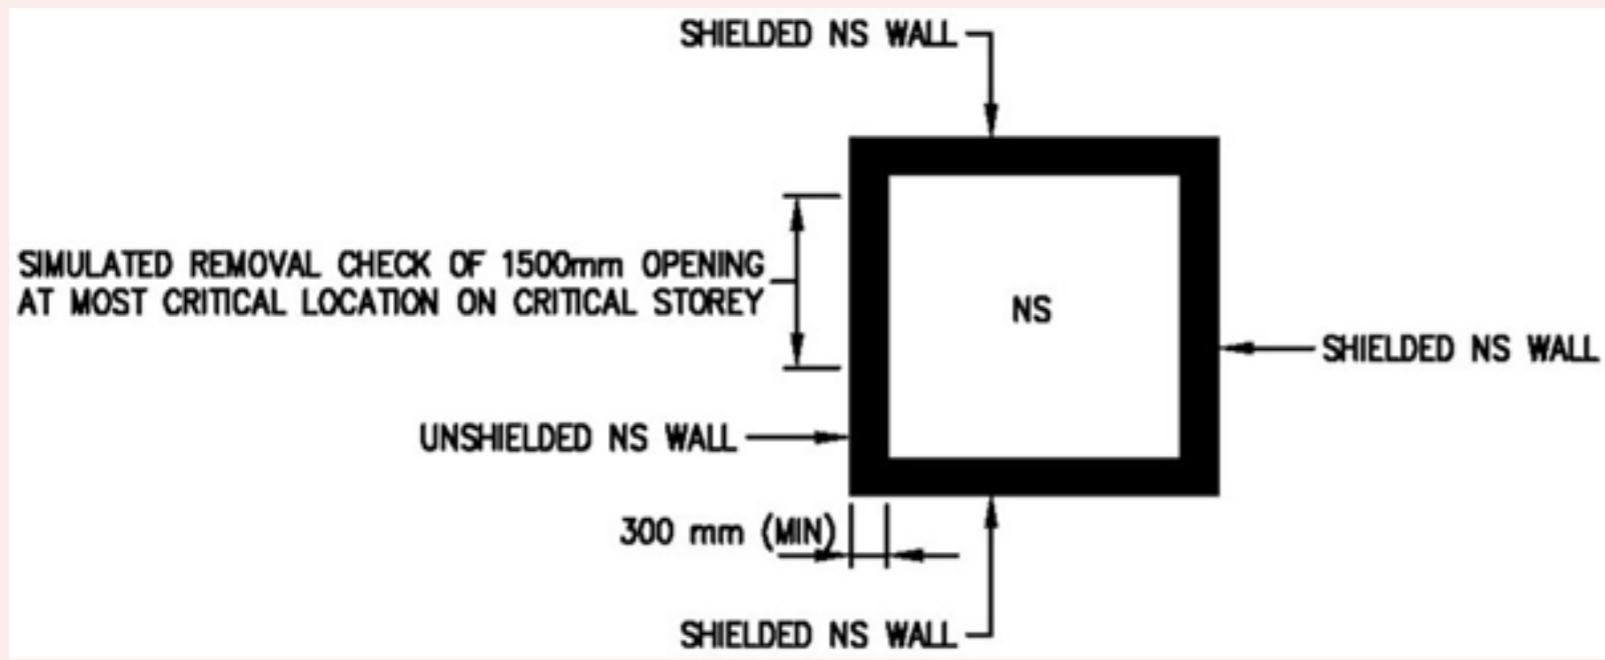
(b): UNSHIELDED NS WALL(S) OF SS TOWER (2 OPPOSITE NS WALLS NOT APPLICABLE FOR S/C SS TOWER)
